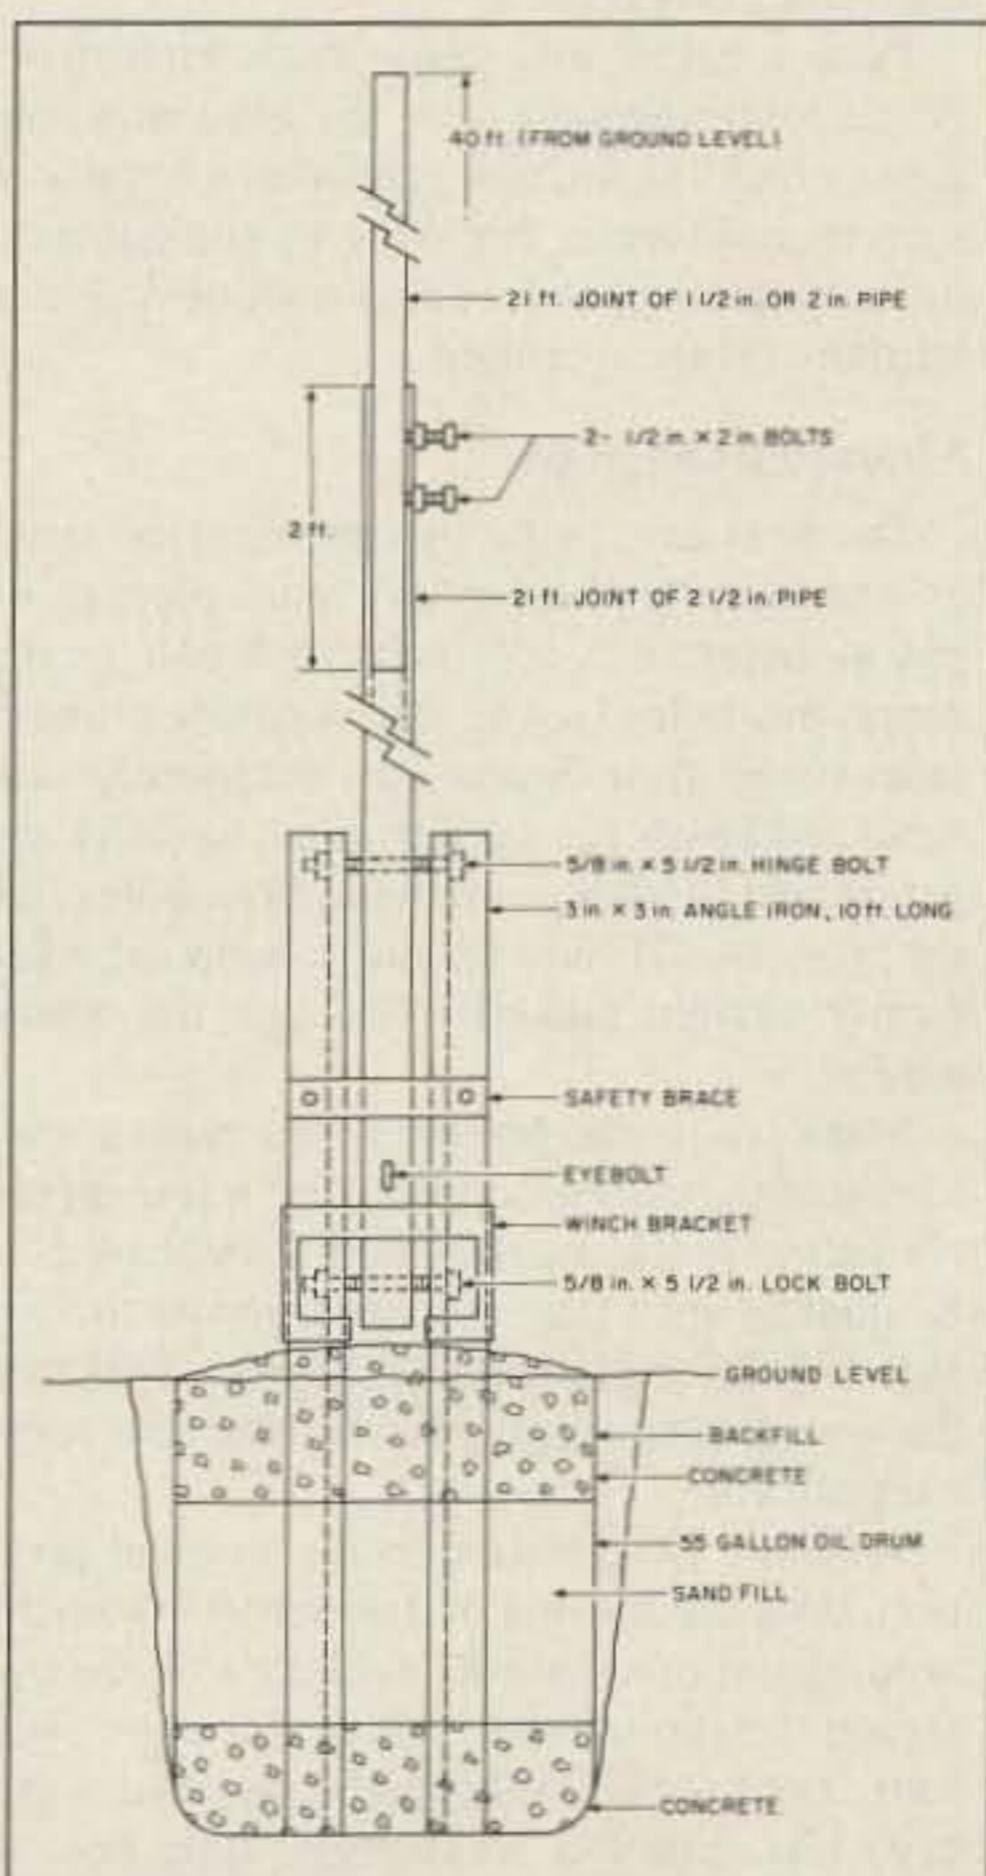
A. Mounting of tower base showing front view of mast-supporting angle brackets.
